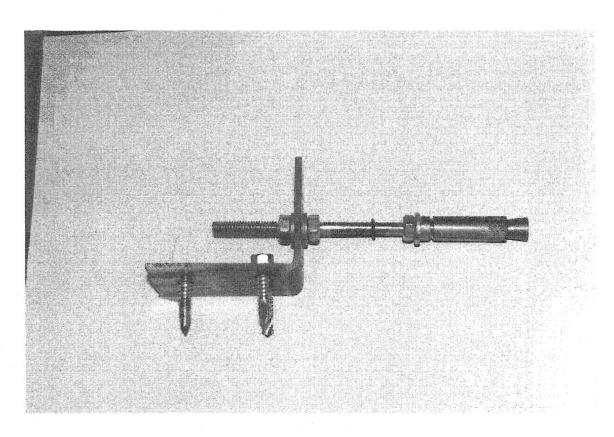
INT2 - Dur-O-Wal Side Mounting Bracket and Expansion Anchor
